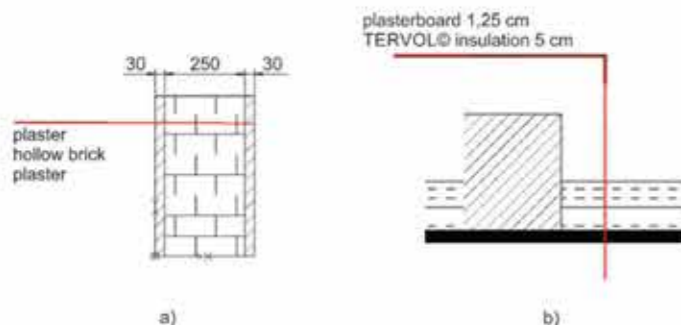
Cross section of construction - a) external wall with hollow brick; b) roof with plasterboard
